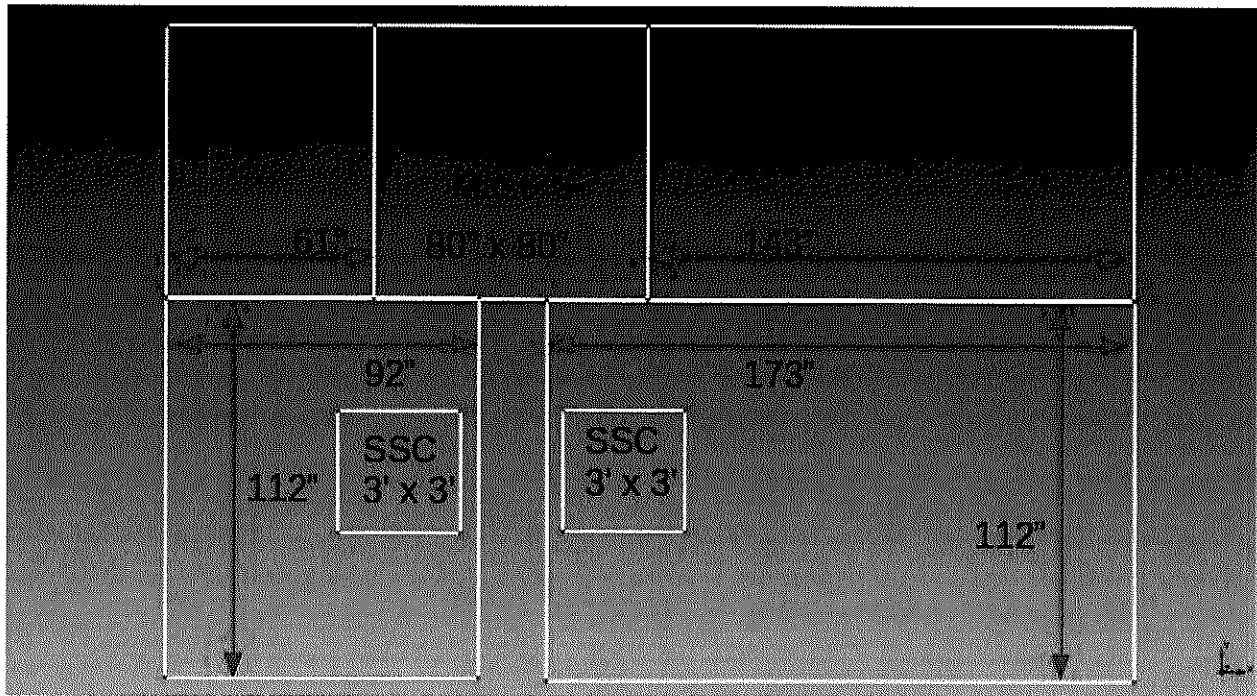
Music Pier Roof Section (ocean at top, shore toward bottom).
